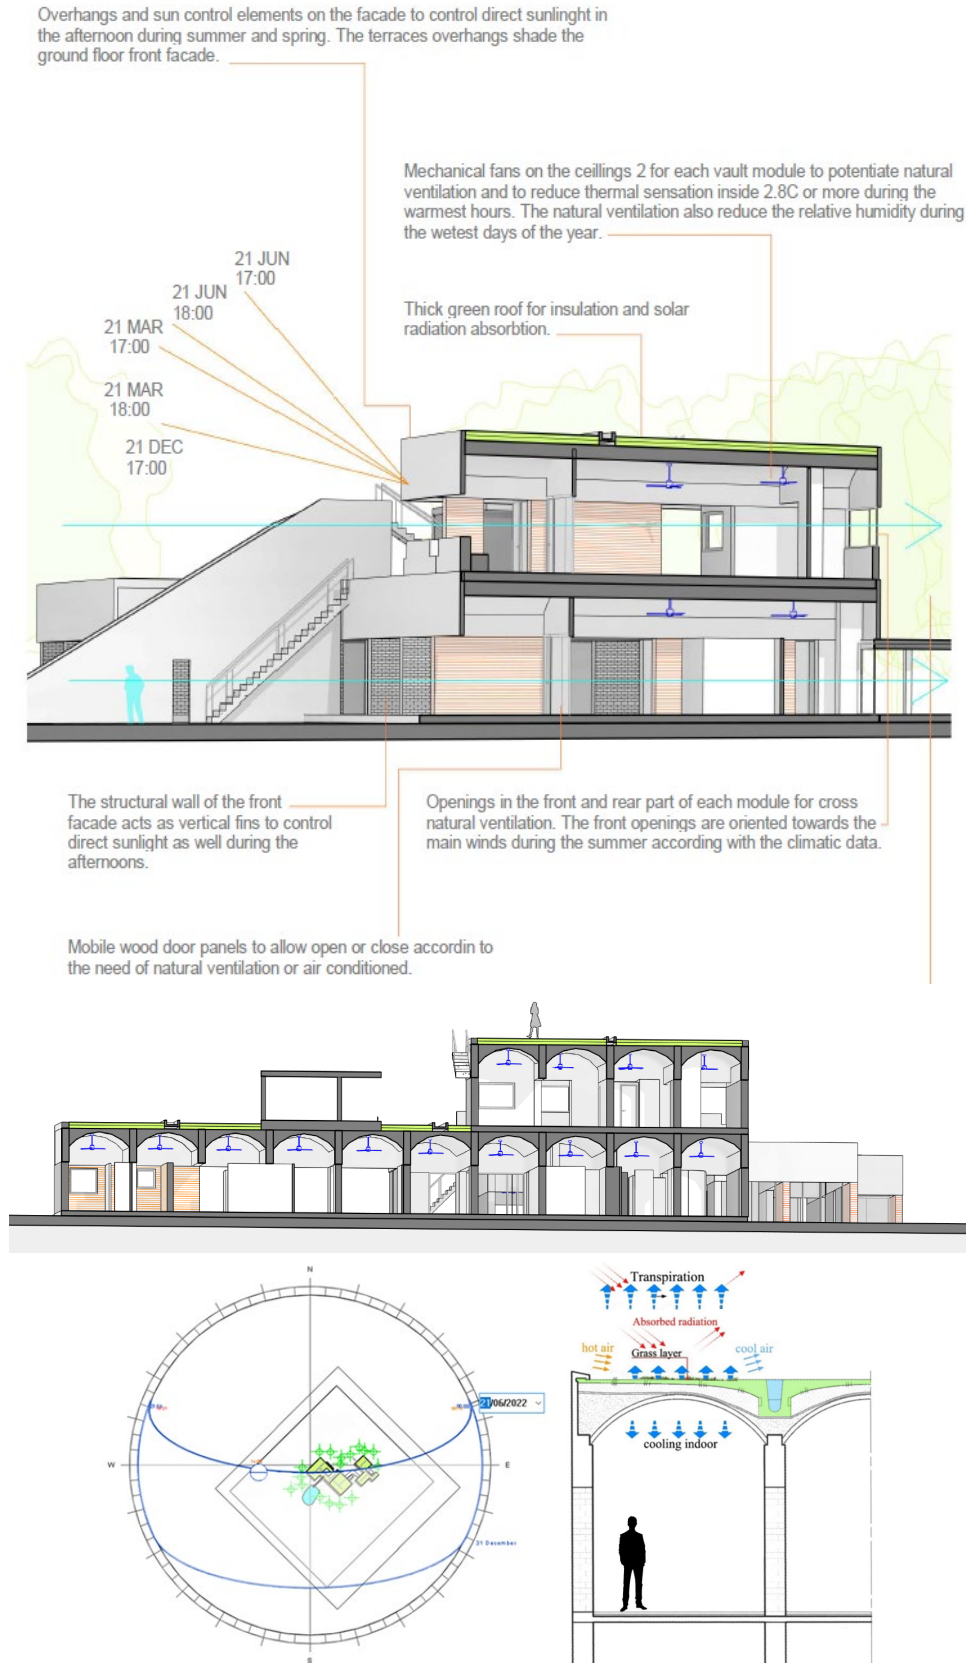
Design strategies applied in the Sarabhai House, longitudinal-section, location site plan with sun path and detail of the green roof. Source: Drawing by the author.
